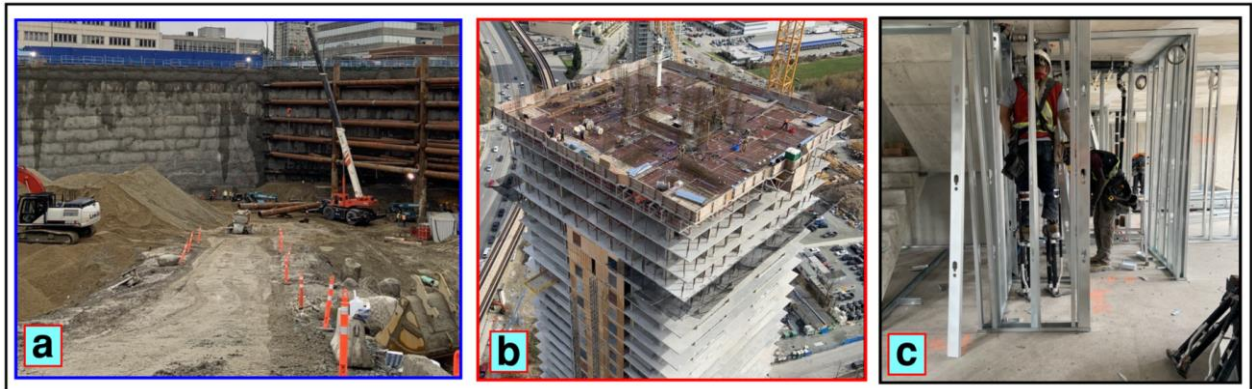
(a) Excavation site (b) outdoor construction (c) indoor construction.
